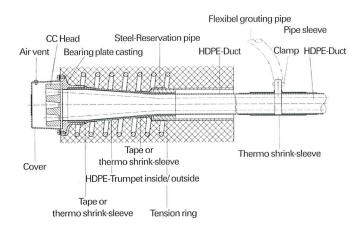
BBR CONA External, replaceable type with bearing plate casting
